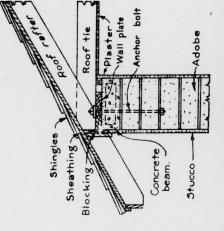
Anchoring a sloped roof to an earthblock wall.
